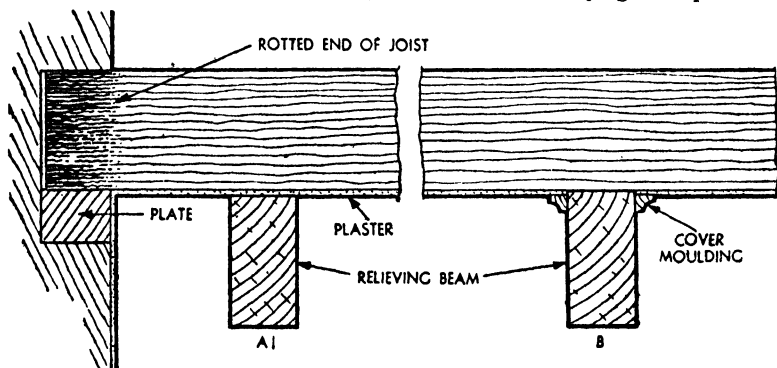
Methods of strengthening weakened joists. A. Relieving beam placed tightly against ceiling to relieve ends of joists of their load. B. In this method plaster ceiling is cut away and beam fitted directly against underside of joist.
